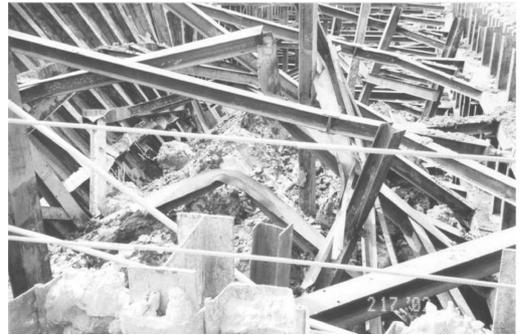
The failed section of the excavation for the Central Services Tunnel, showing the failed base just above the jet grout slab and the north wall rotated inwards.
